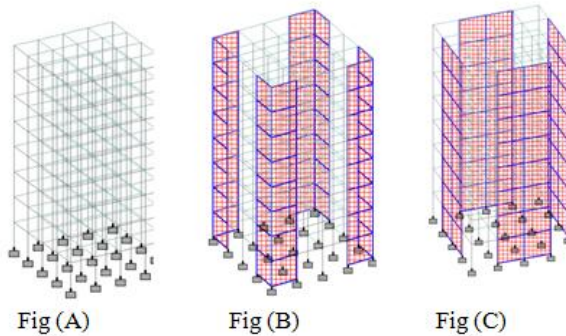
Figures shows different modals (A) without shear wall (b) shear wall on edges (C) shear wall on sides
